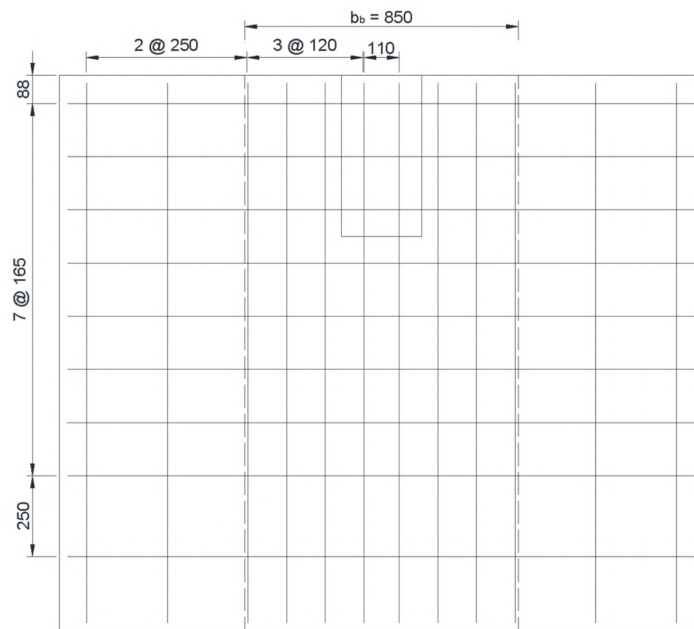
Top mat reinforcement details for Specimen 4 (15M bars) (units in mm)
